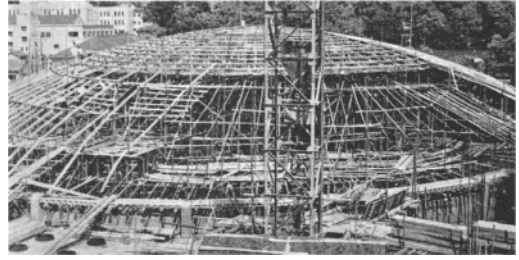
Formwork installation of Ehime Prefectural Citizens' Hall (Tsuboi 1953b).
